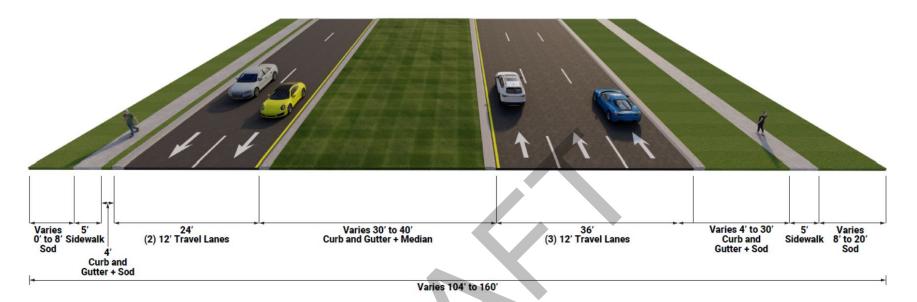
Bonita Beach Road from Arroyal Road to Spanish Wells Boulevard
